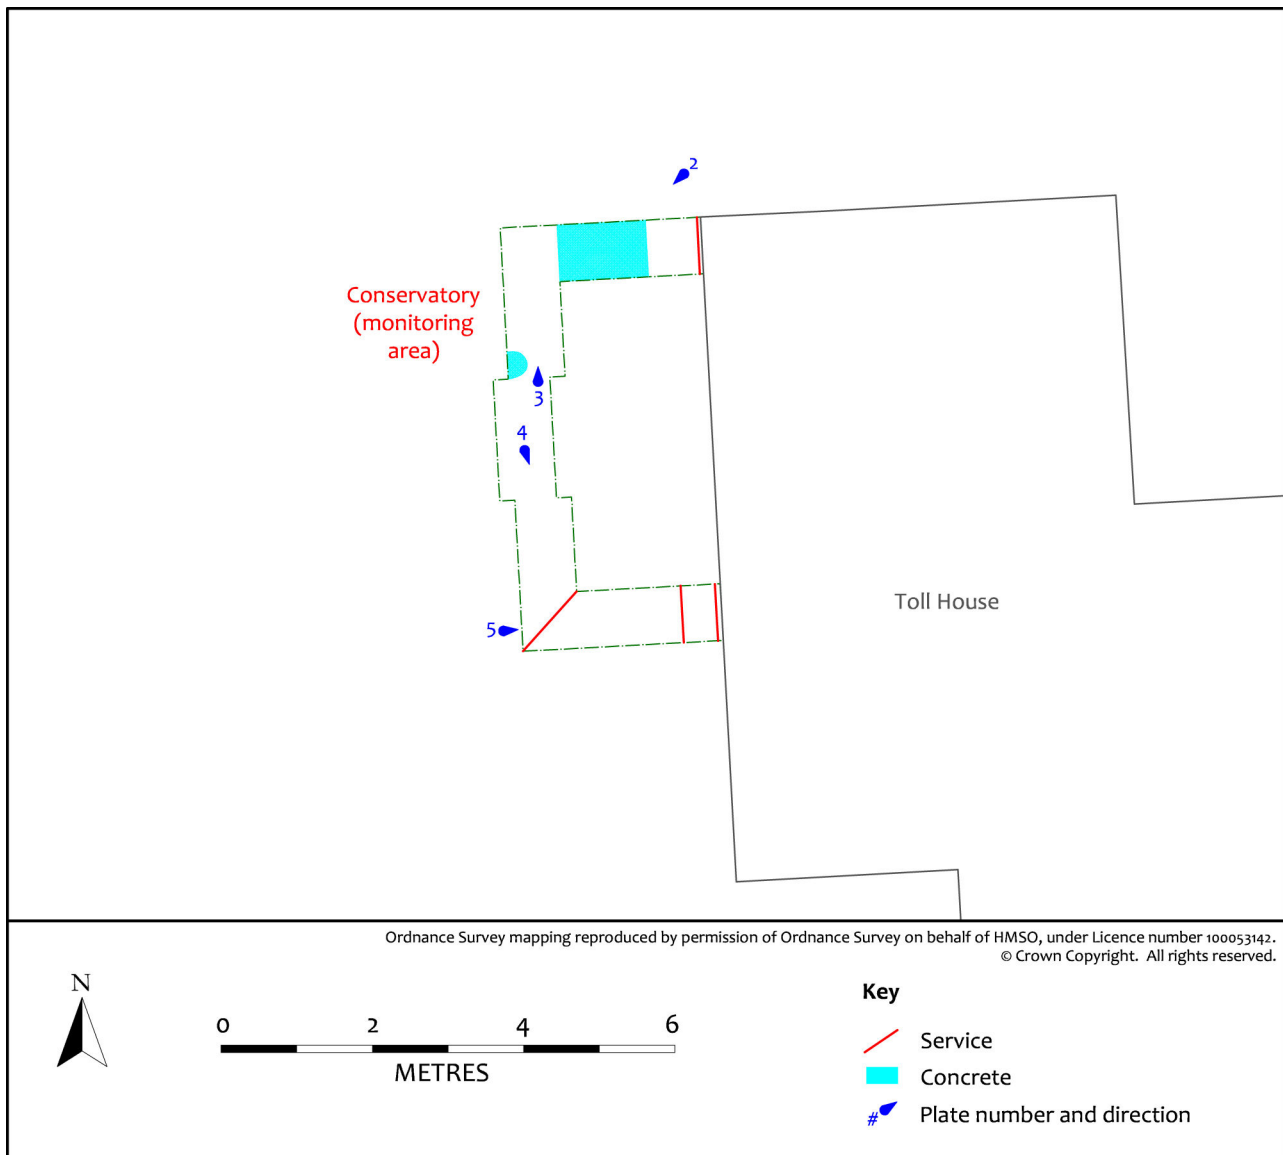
Detail of the trenching plan, showing the modern services and concrete.
